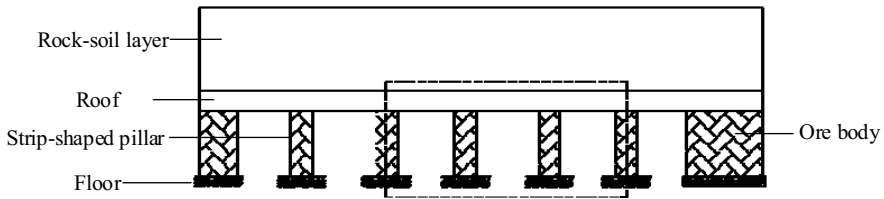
Structural system of the multiple strip-shaped pillars and roof
